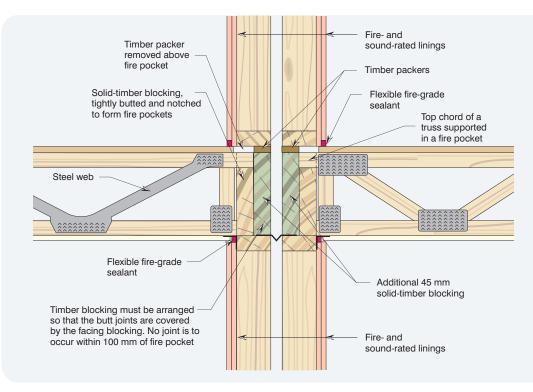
Floor truss supported by fire pockets in fire- and sound-rated wall – FRL 60 minutes – elevation view.
